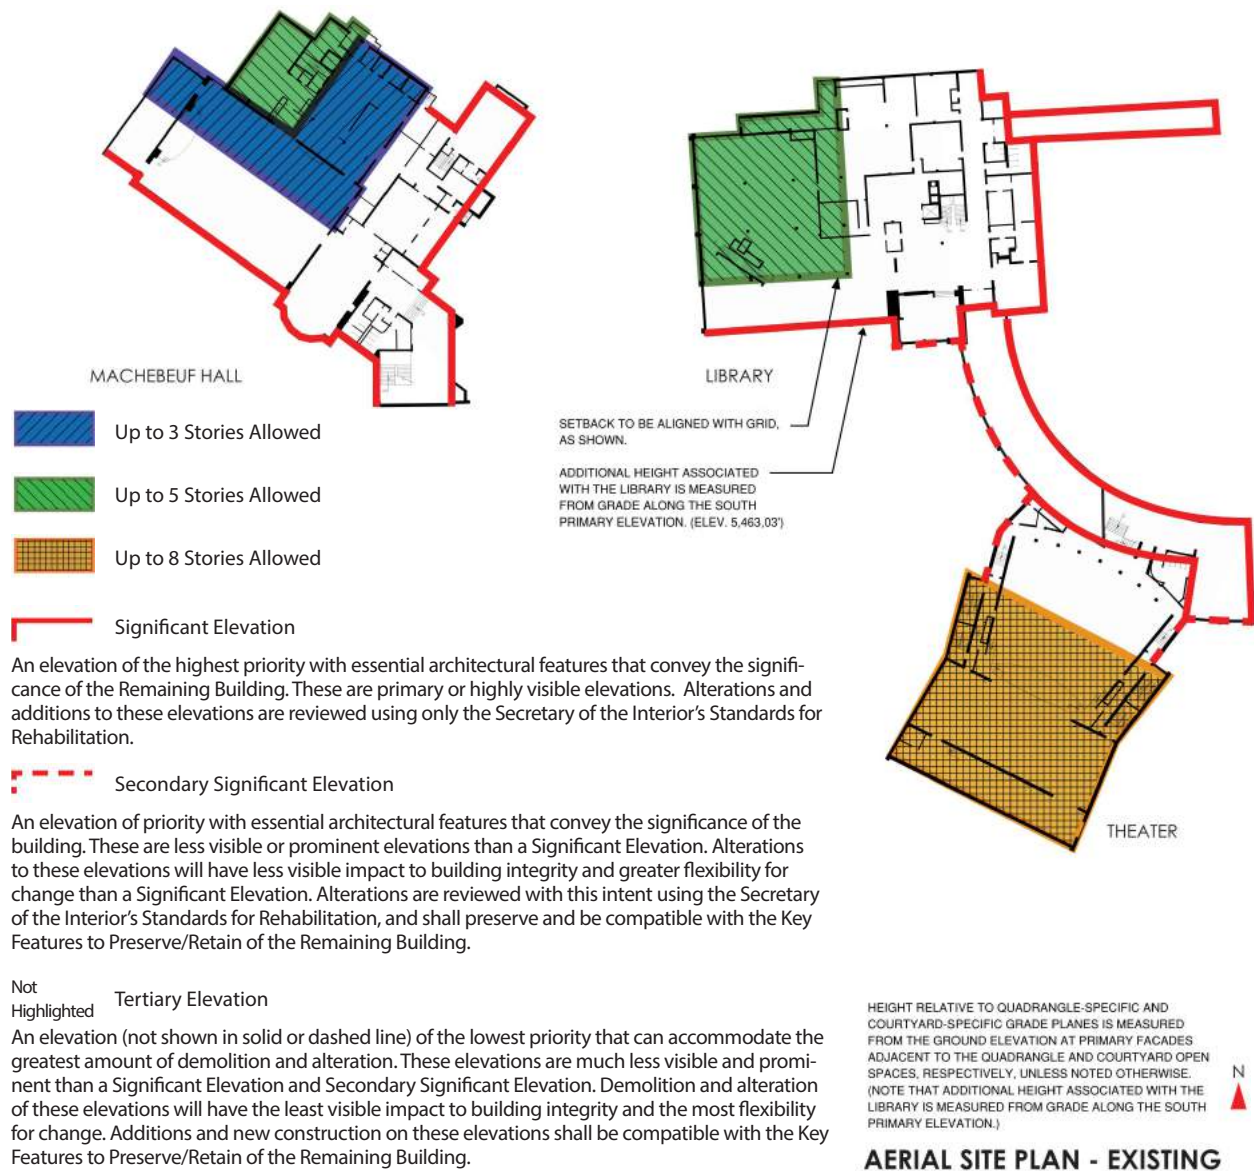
Building Elevations and Potential Addition Locations for Machebeuf Hall and the May Bonfils Stanton Theater & Library
